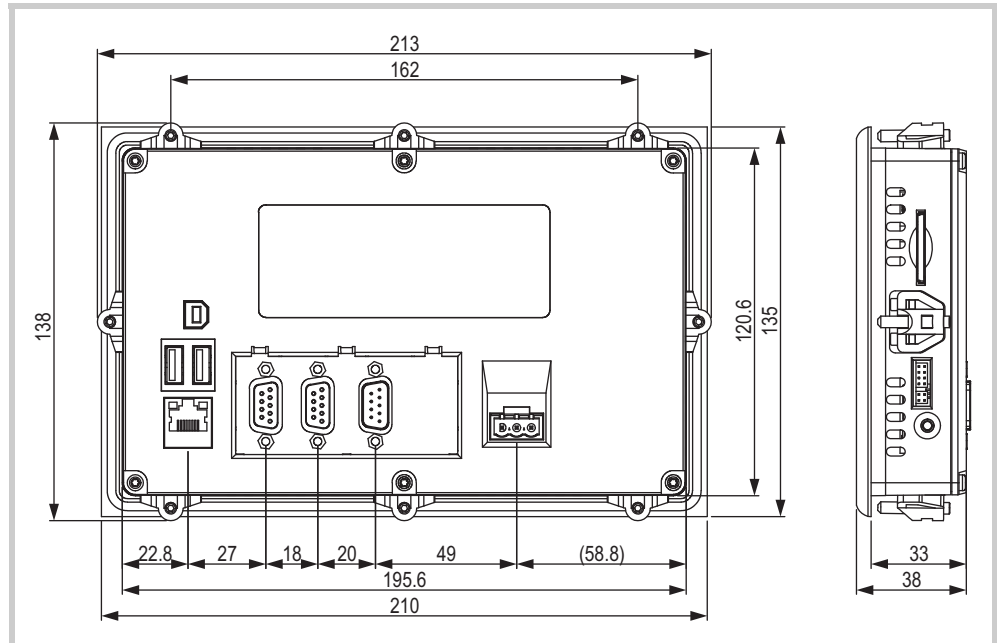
Mechanical dimensions of the 7.0" devices in mm
